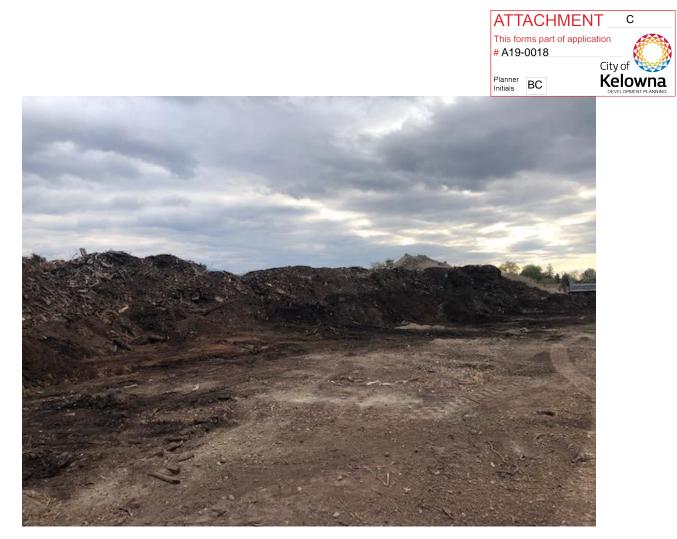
Remnant wood waste has been and will continue to be reduced as part of the site operations
